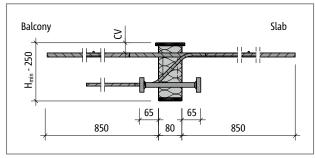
Schöck Isokorb® T type K-M12: Product section
